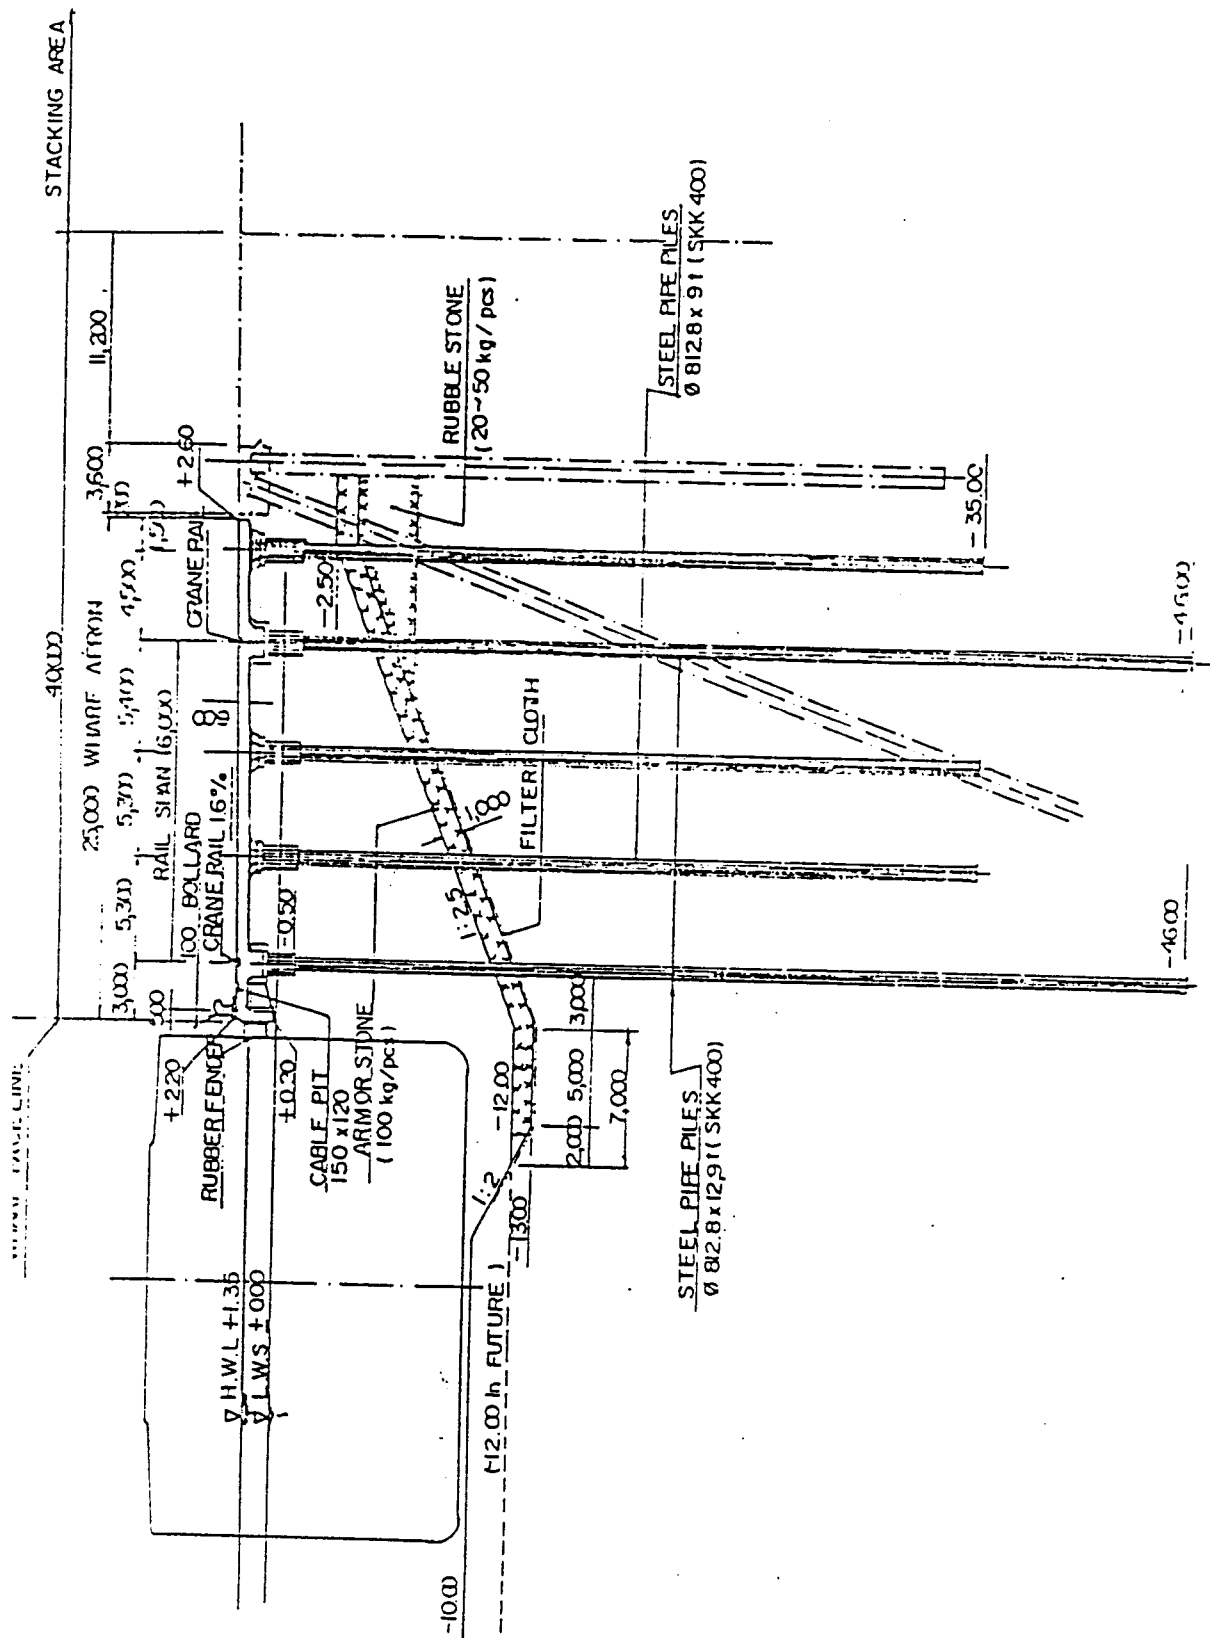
(1)-2 Typical Cross Section of Container Wharf
